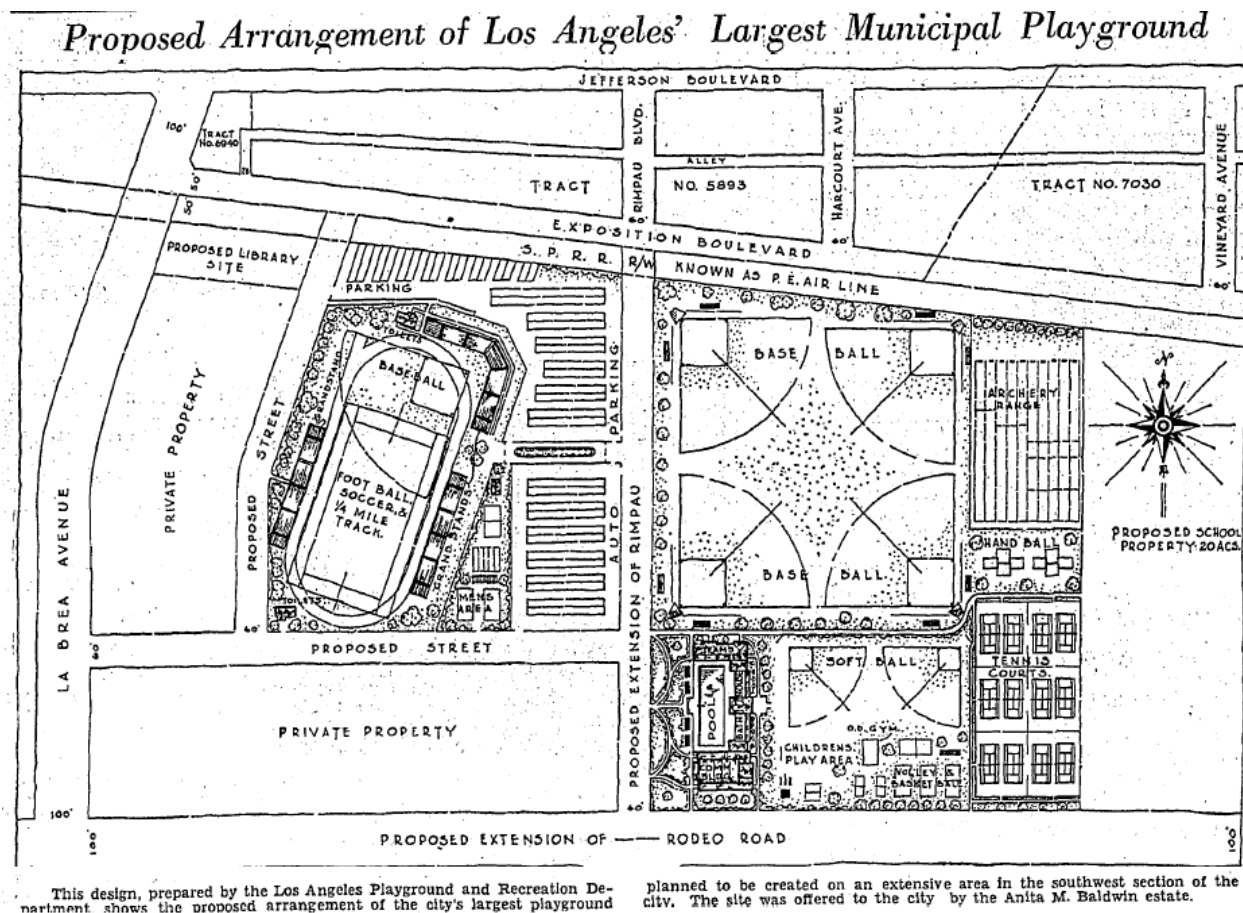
Plan for new playground, 1936 (LAT 1936b)
